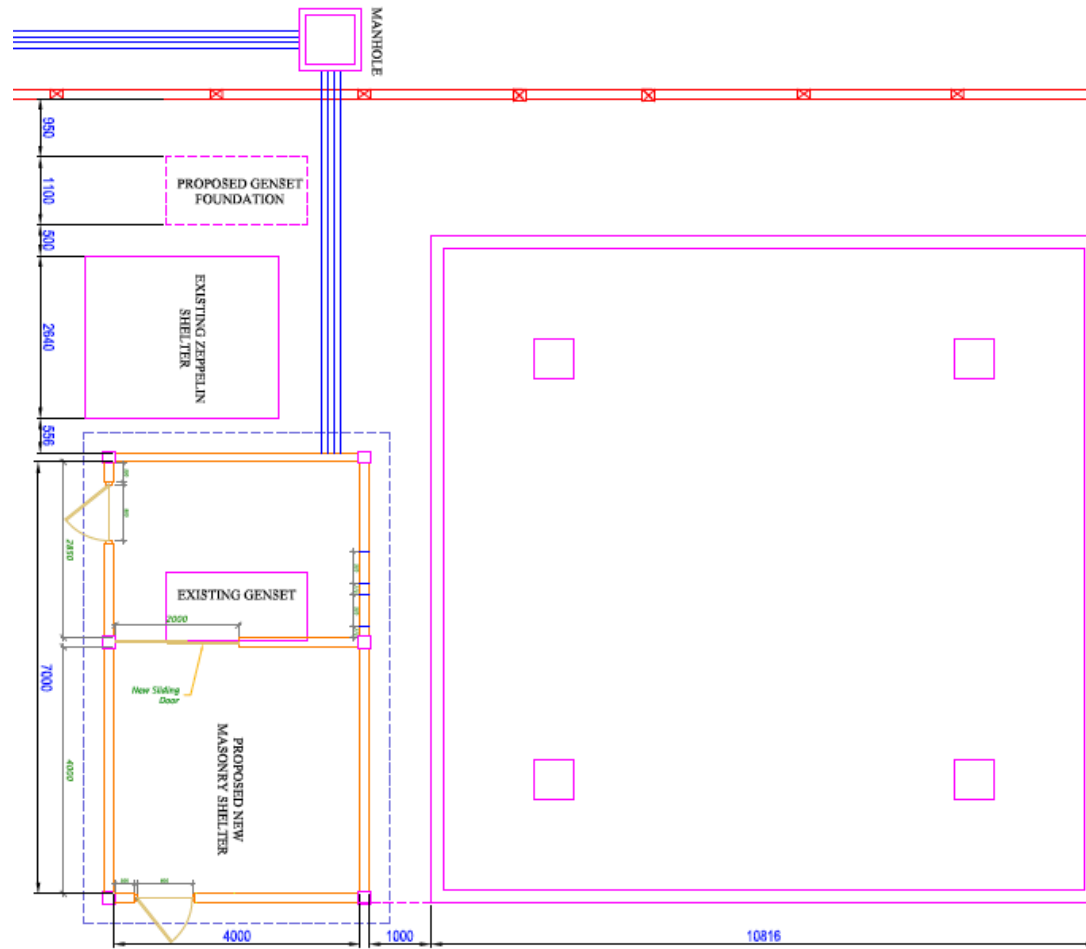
Site plan of masonry shelter in Hithadhoo, Addu City
